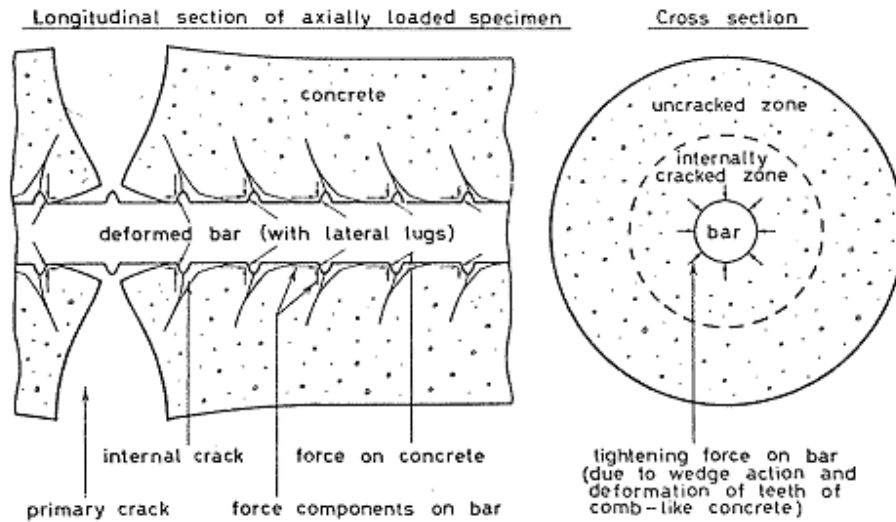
Deformation of concrete around steel reinforcing bar after formation of internal cracks (Goto, 1971)
